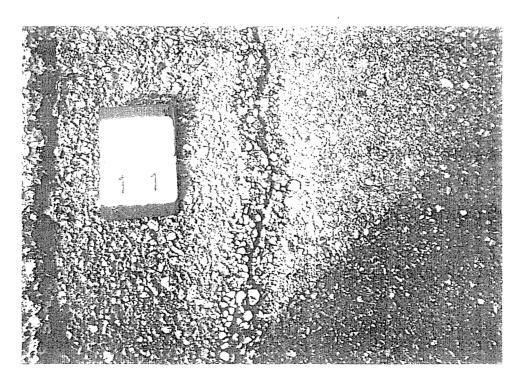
Crack of Photo 3.23 After Vacuum Blasting
